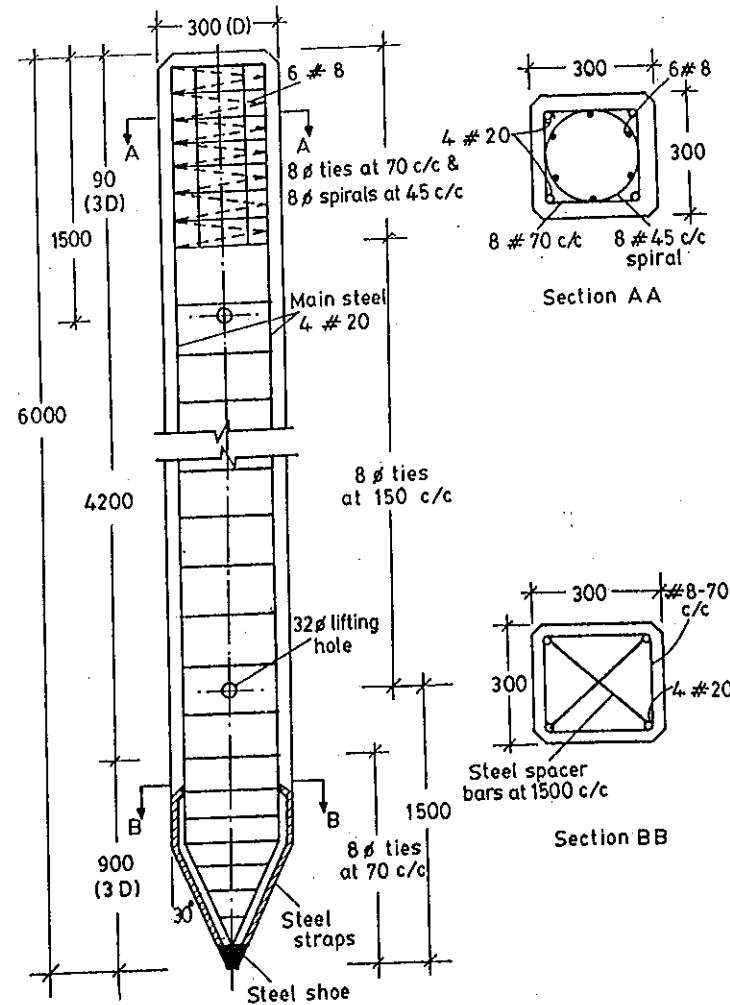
Details of Reinforcement Details in Precast Pile
